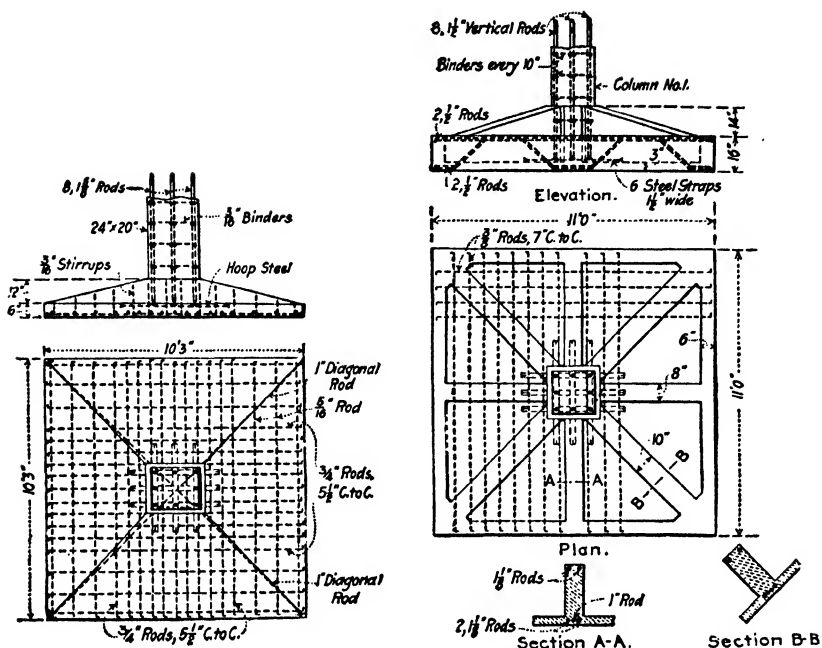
Pyramidal and Ribbed Slab Footings of Reinforced Concrete, Atlanta Terminal Station, Southern Railway.
